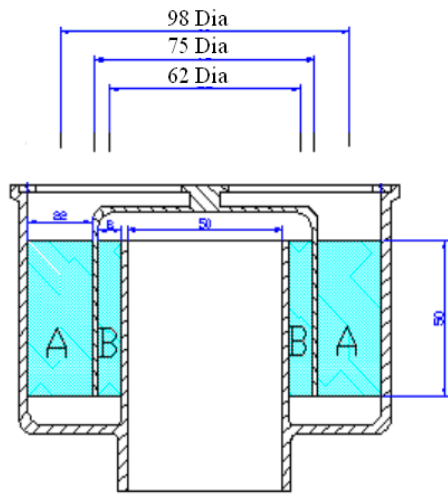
, shows a smart pipe connection to refill water to floor trap
